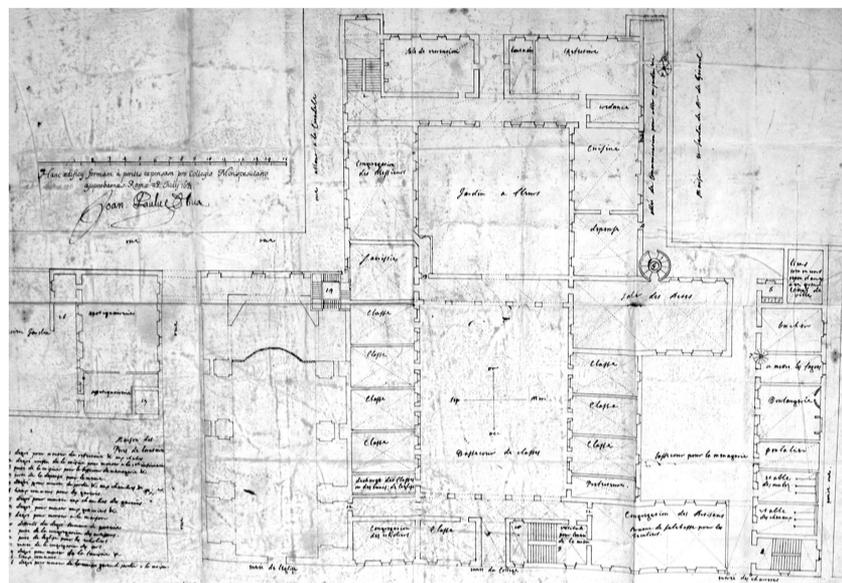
Plan of the Jesuit College, second half of the eighteenth century
